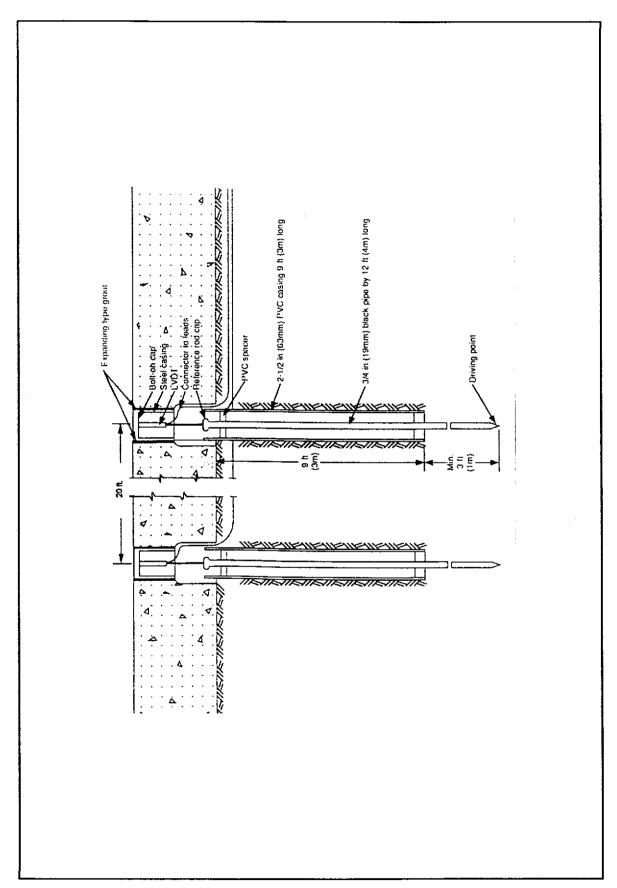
Longitudinal Section of the Instrumentation layout.
